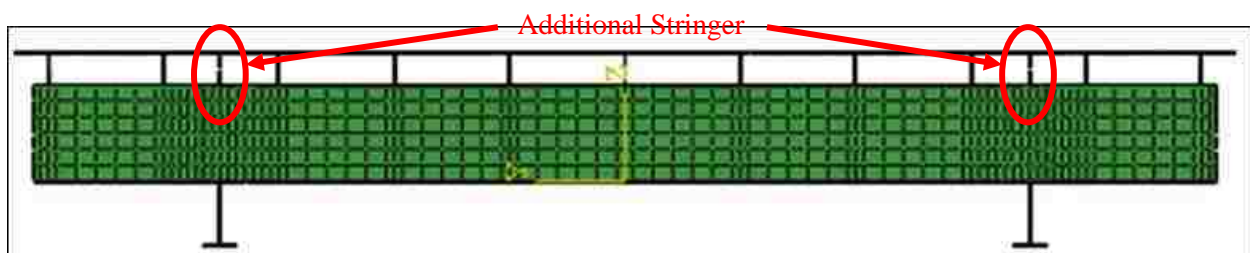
Bridge cross-section after adding additional stringers to FE model
